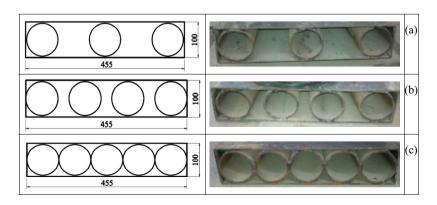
Cross section of (a) three-tube-core sandwich panel, (b) four-tube-core sandwich panel and (c) five-tube-core sandwich panel (Unit: mm).
